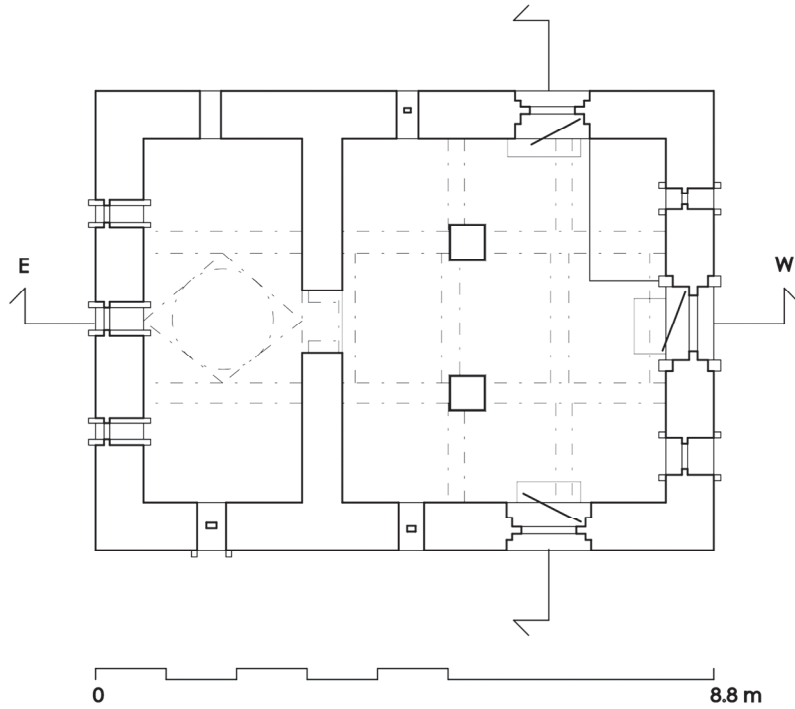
Church of ʾĪmäkina Mädhane ʿAläm, Wällo, floor plan; drawing by Zara Thiessen
